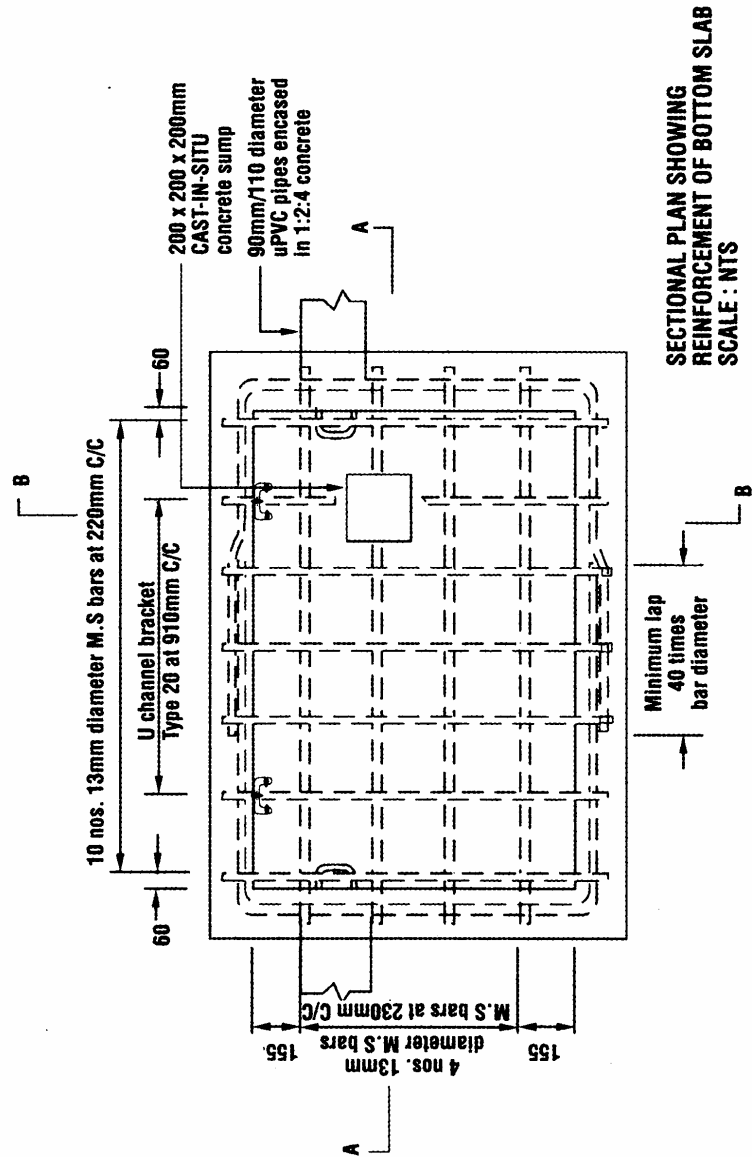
MANHOLE DRAWINGS - TYPE MX1
